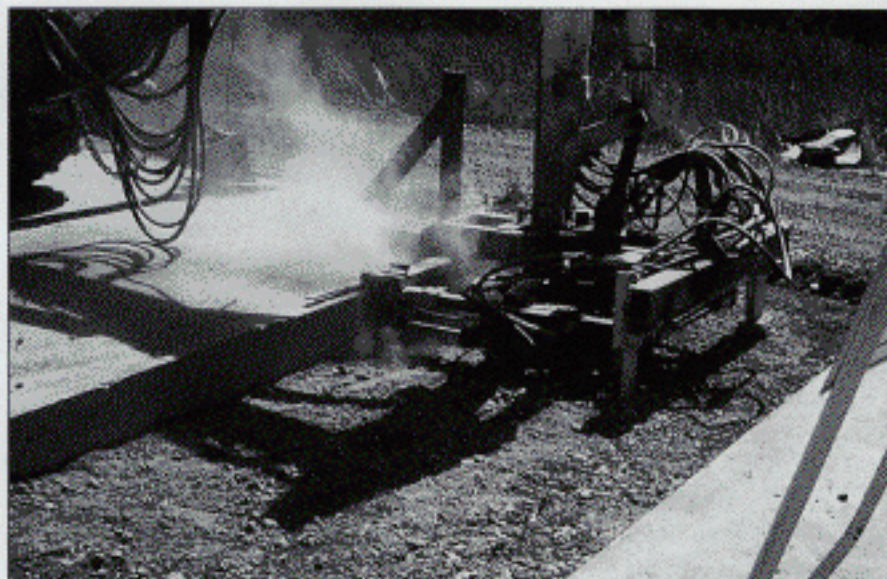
Automatic dowel drilling rigs produce straight, consistent holes faster than single, hand-held drills.
